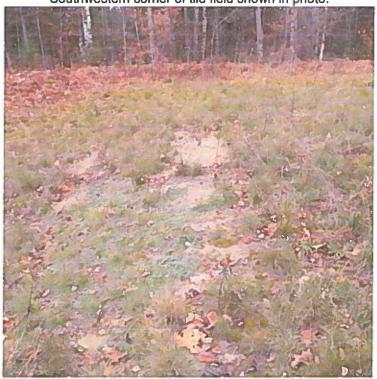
125617: Topsoiling required on south slope of tile field.
